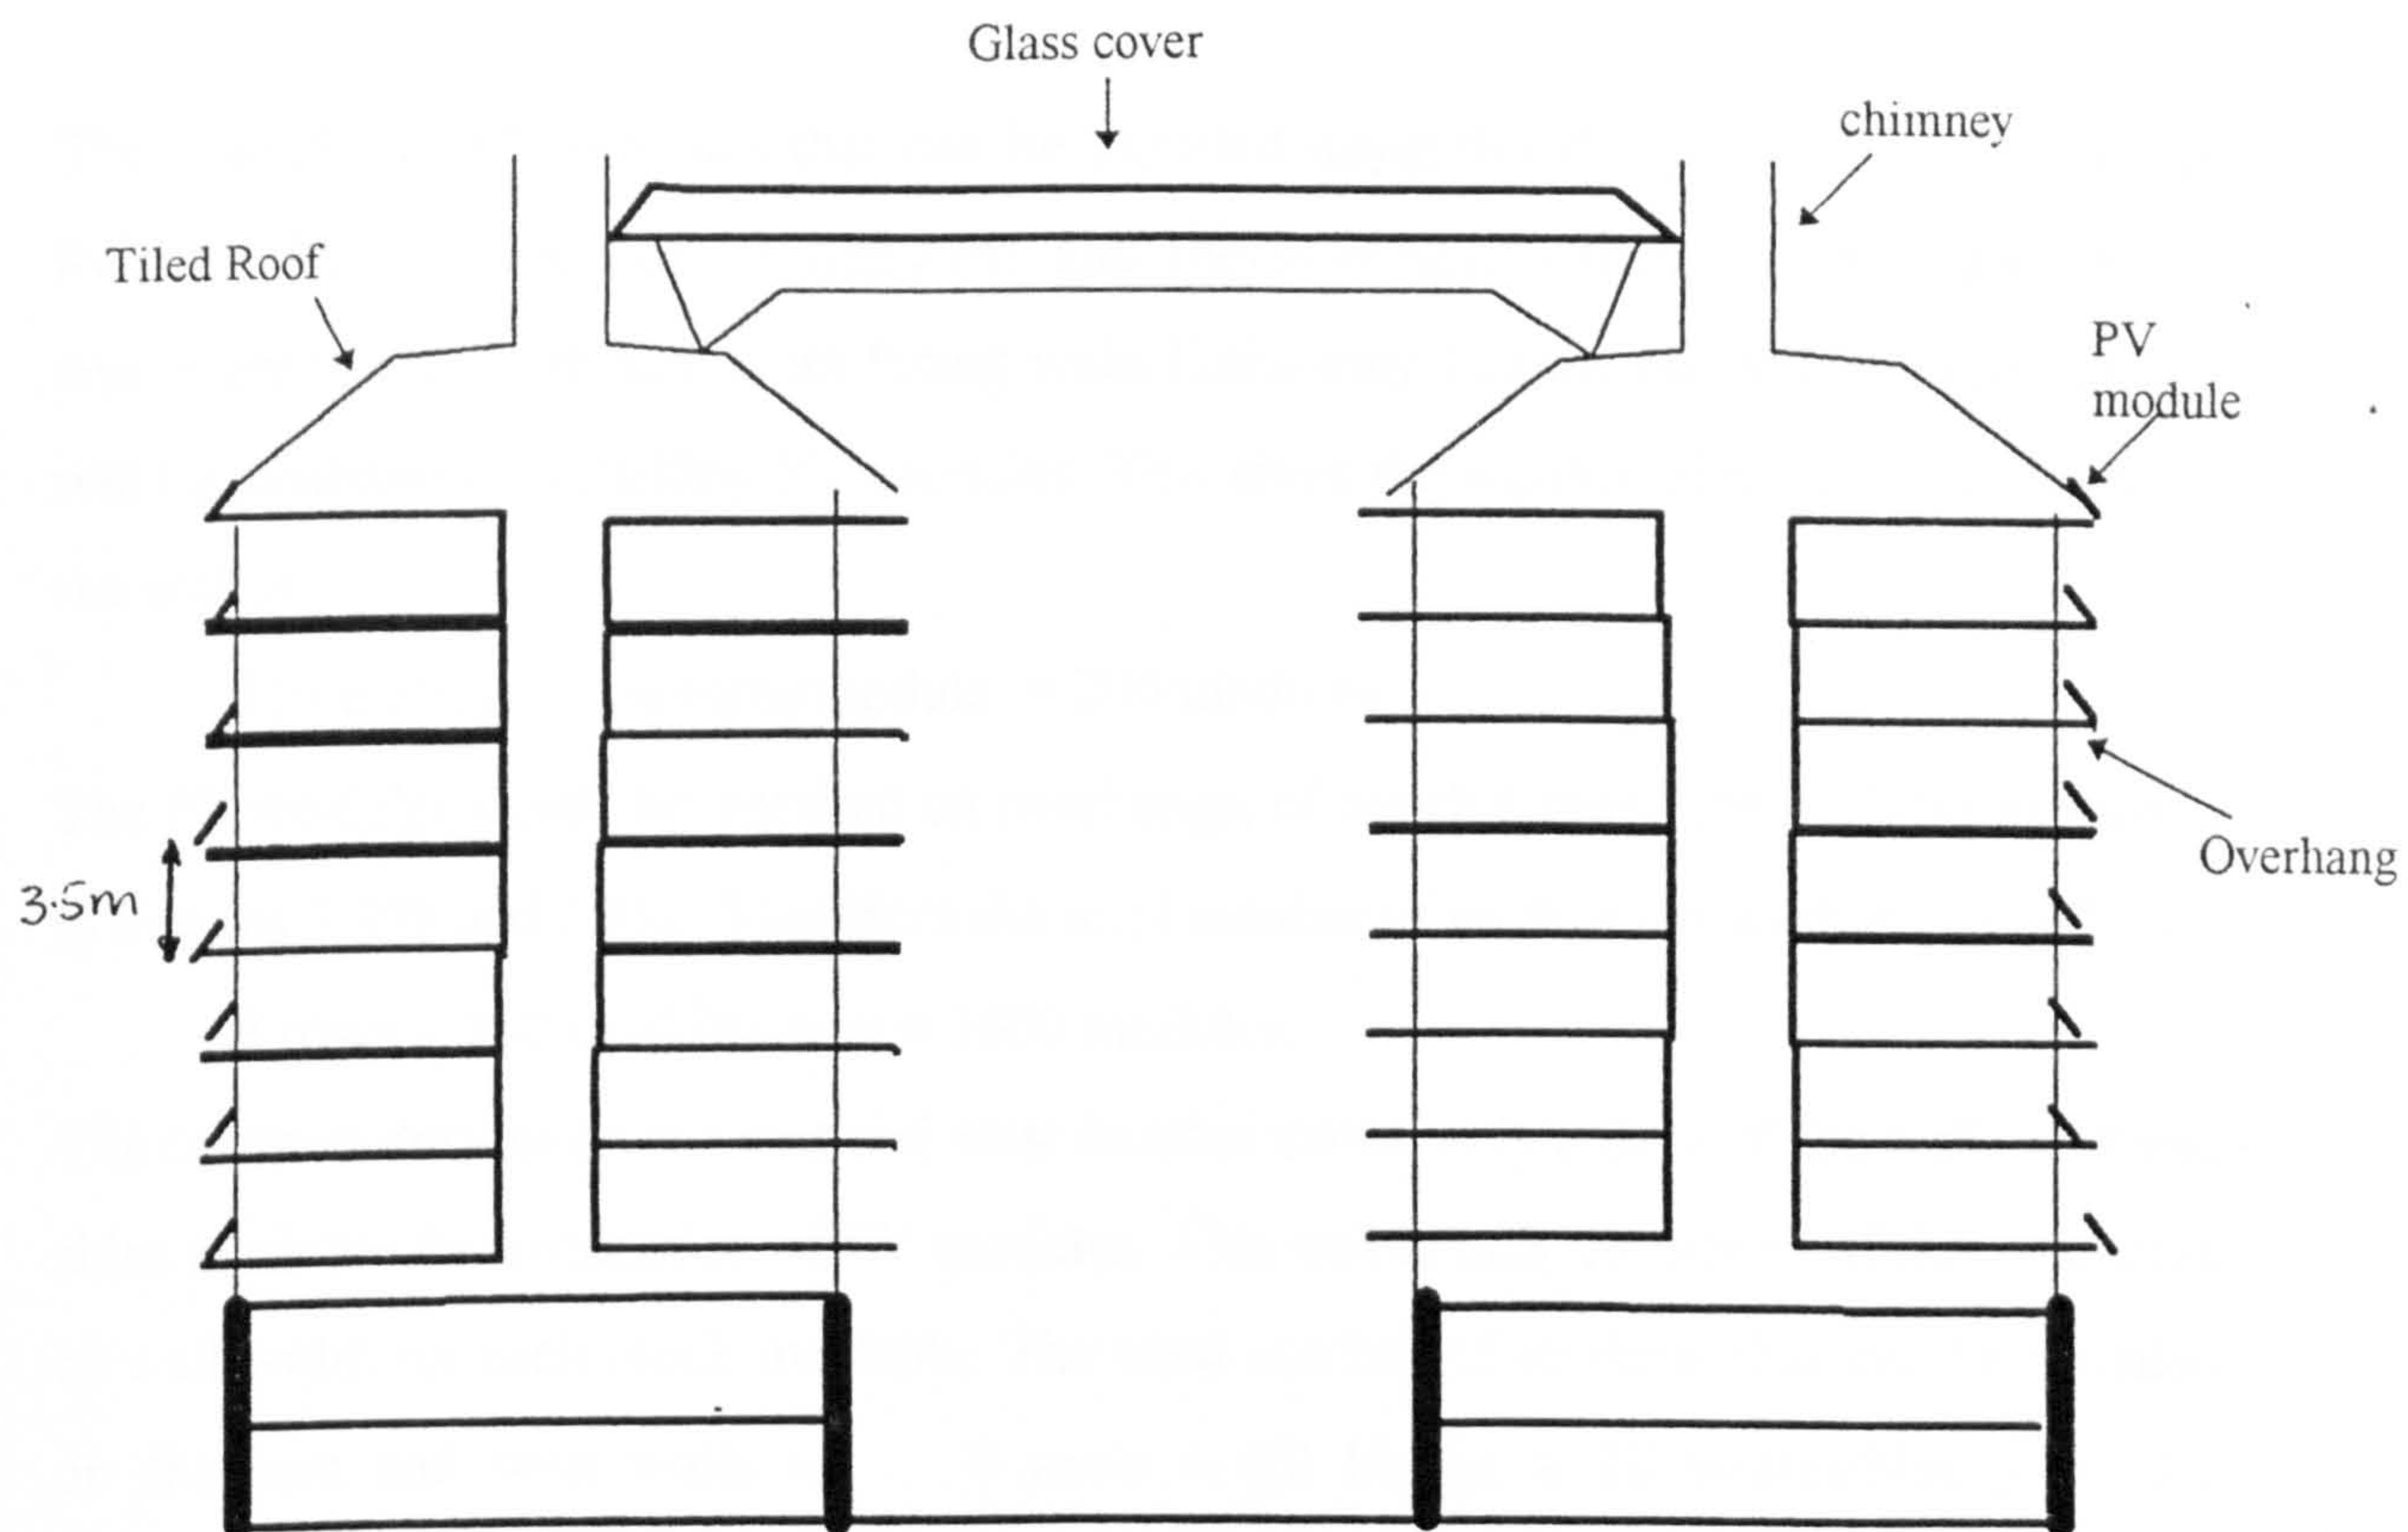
Cross Section of Passively Ventilated Building showing the position of the PV Modules on The Overhangs
